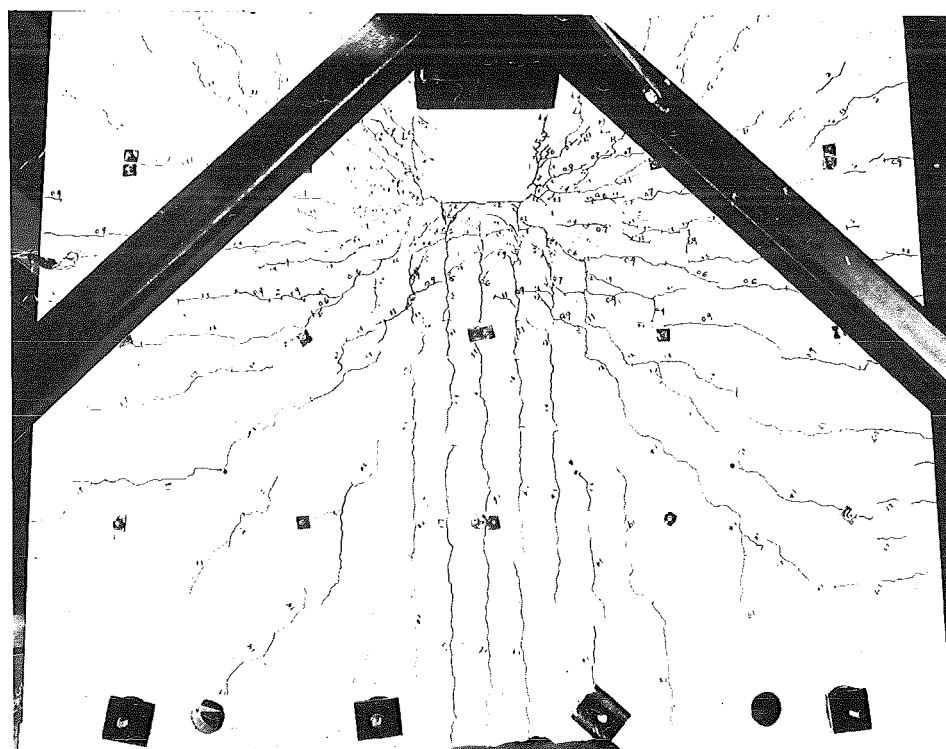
CRACK PATTERN OF SPECIMEN 2
